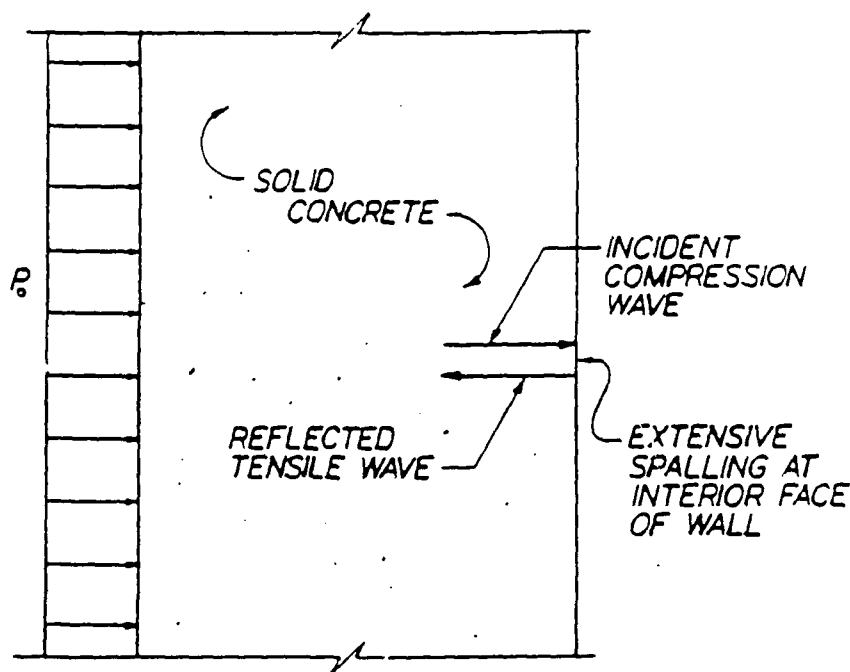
Blast Wave Propagation in Monolithic Wall of a Typical Protective Shelter.
